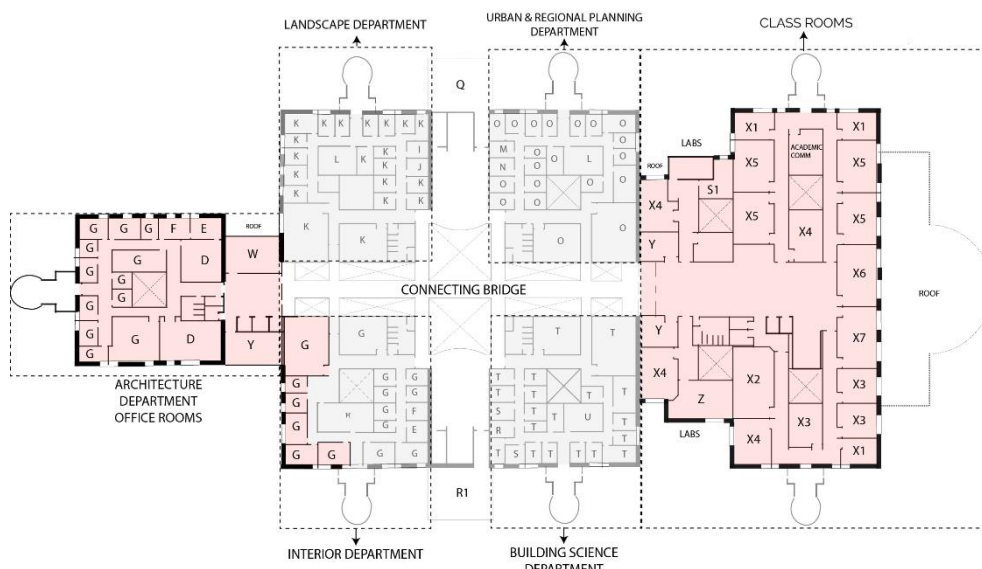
College of Architecture & Planning: Second Floor Plan (not to scale)
